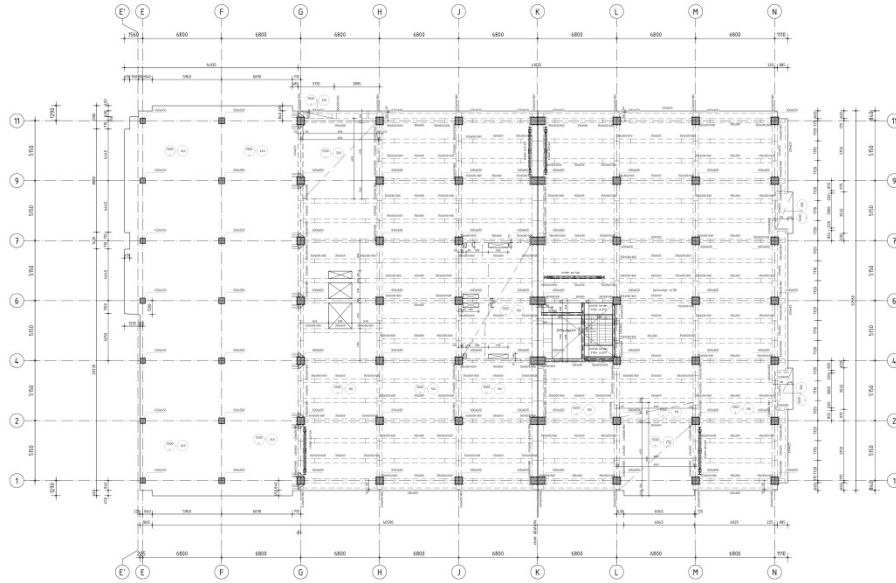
Groot Willemsplein - Structural drawing of the second floor, existing structure, Groot Willemsplein building
